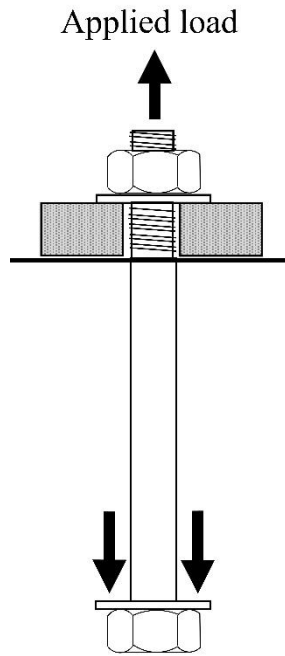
Load transfer mechanism for headed stud anchors.
